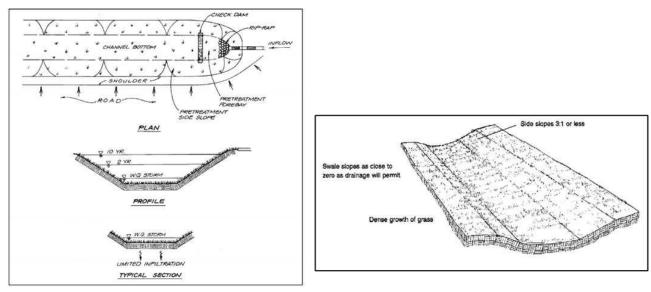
Plan, Profile, and Section Views of Grass Swale (ref: TRCA, 2010)
